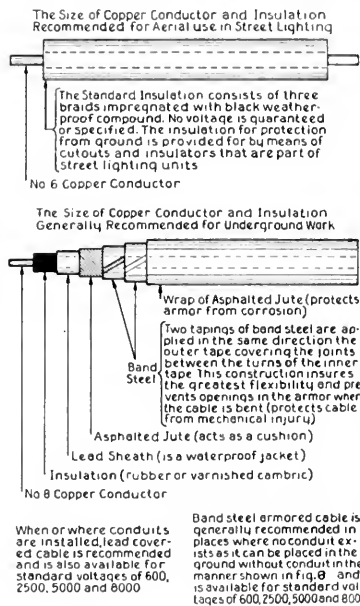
Standard Insulations for No. 6 Aerial and No. 8 Underground Alternating-current Series Street Lighting Cables
